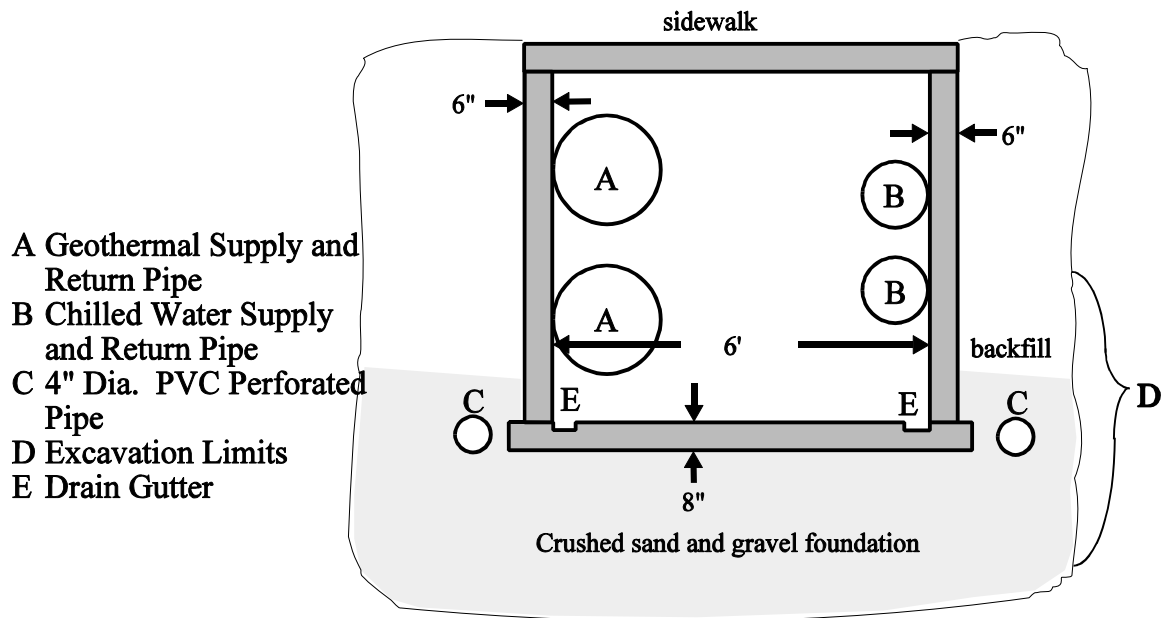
Tunnel construction detail (Lund an Lienau, 1980).
